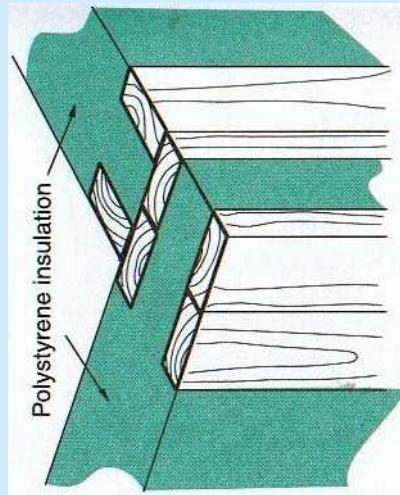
Sample Pre-formed Panel Wall System, Corner Detail
